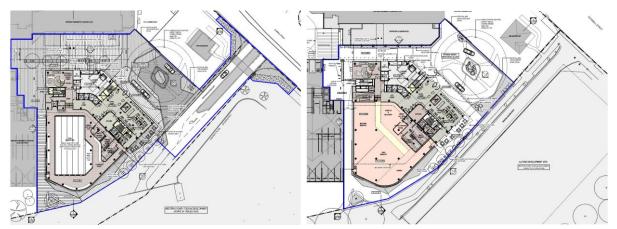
Ground Floor and Access (Original DA and as revised, Hassell)
